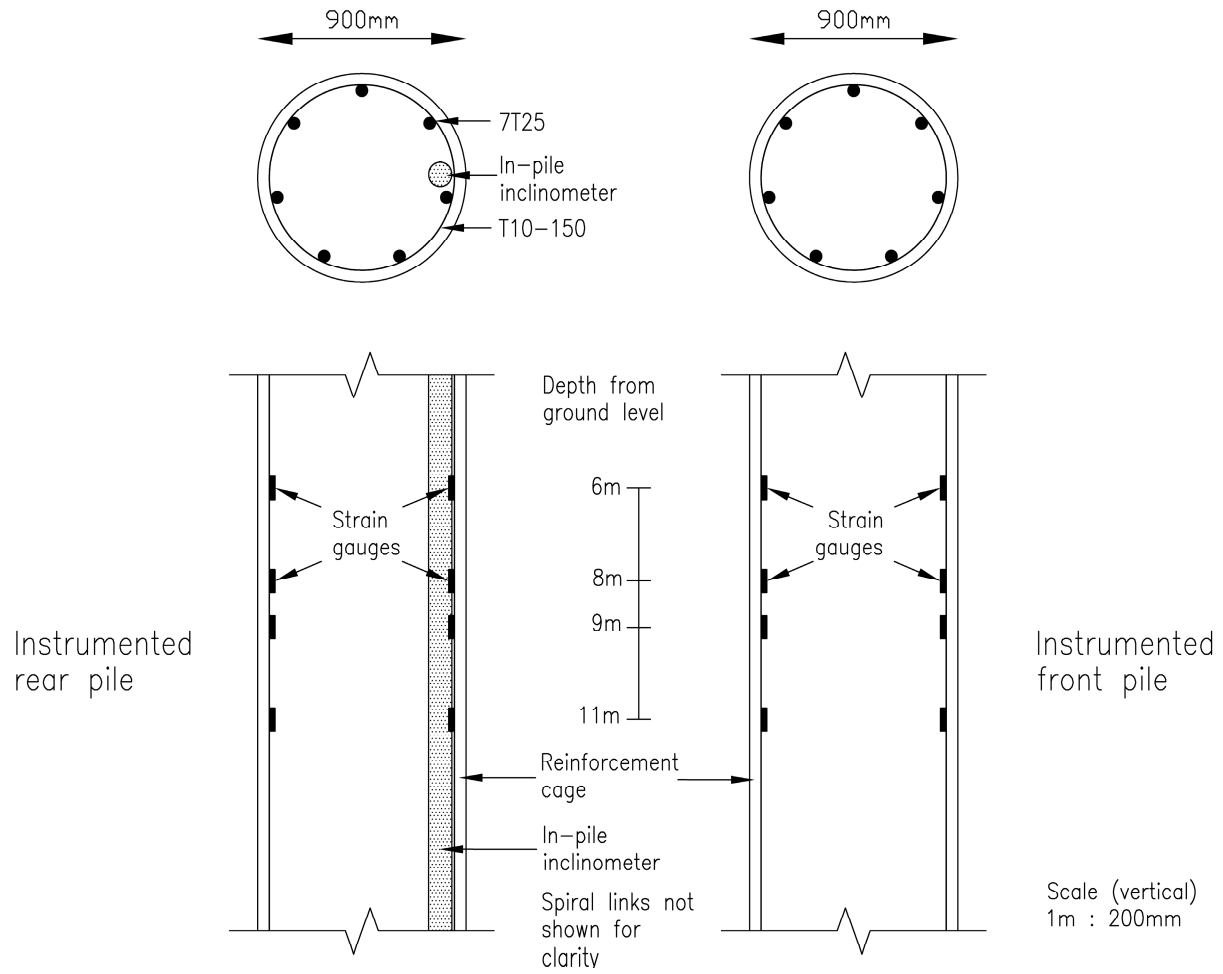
Layout of instruments attached to reinforcement cages of the bored piles
